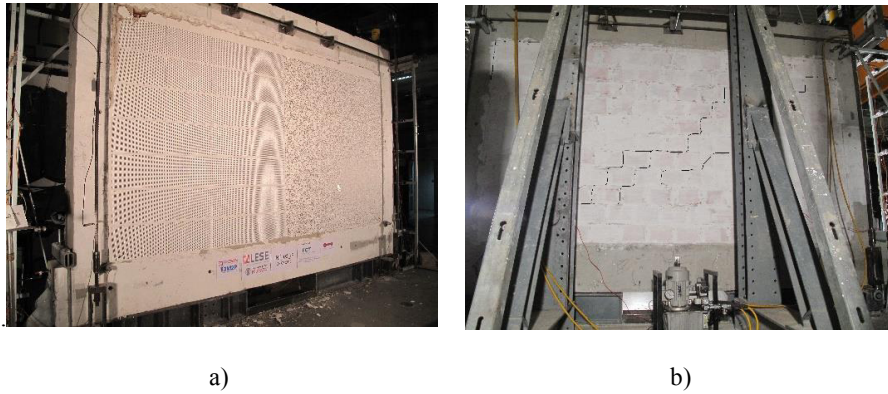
In-plane final cracking pattern: a) Stronger panel (t=150mm) and b) weaker panel (t=110mm).
